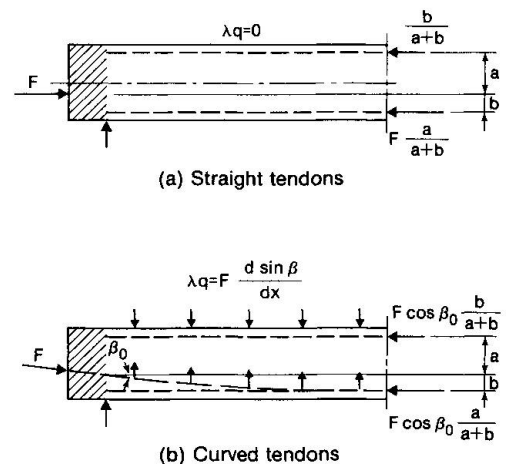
Prestressed Concrete Beams with Thin Webs and Massive End Blocks
